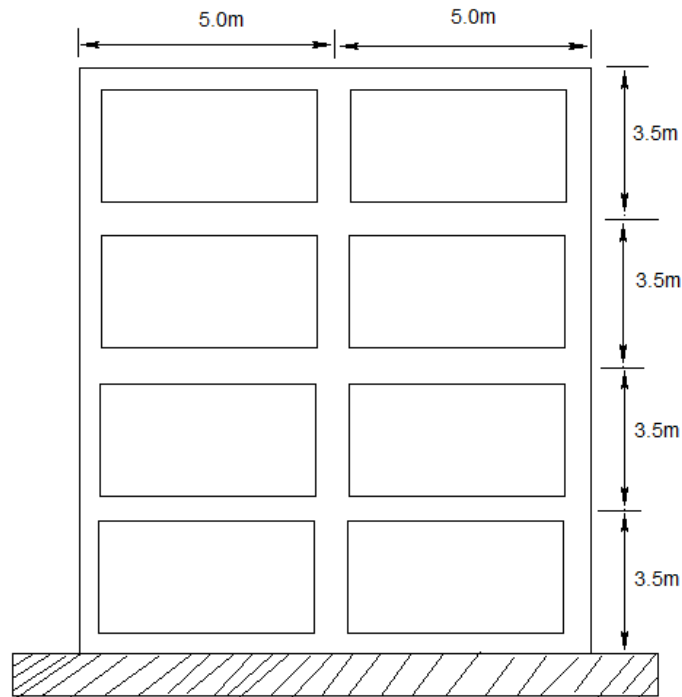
a: Plane frame structure (Four storeyed building)
